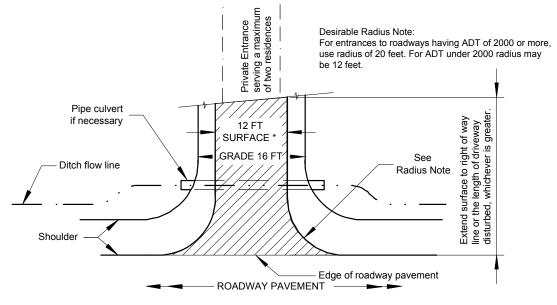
PRIVATE ENTRANCE DETAIL
